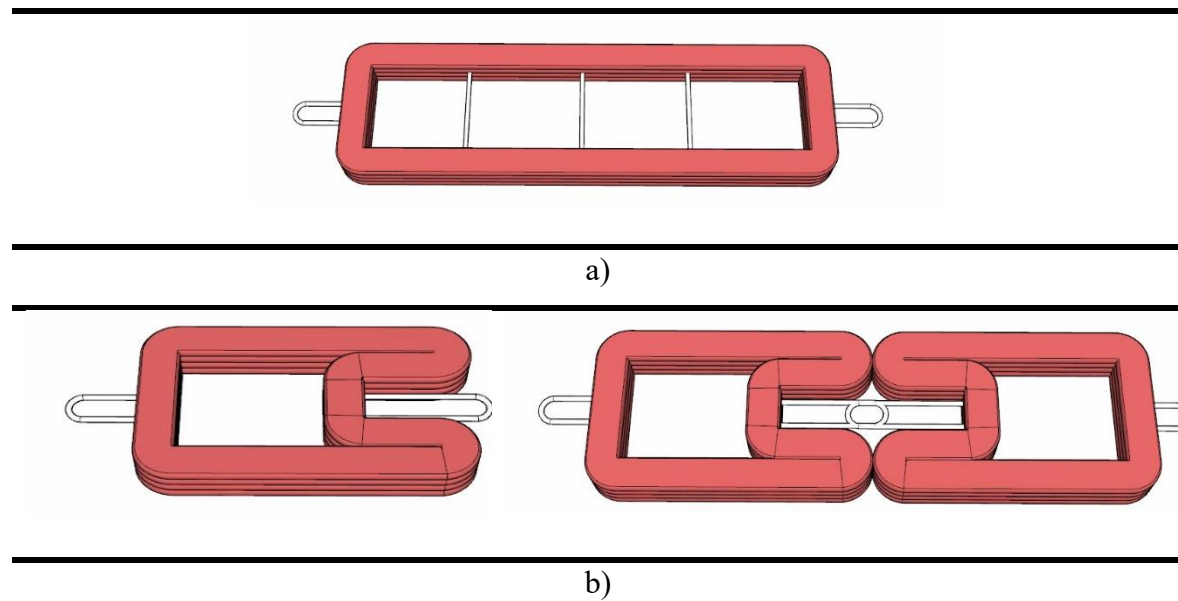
Schematic representation of a) monolithic 3D-printed wall (MW), b) modular 3D-printed wall (MoDW) and joint details.
